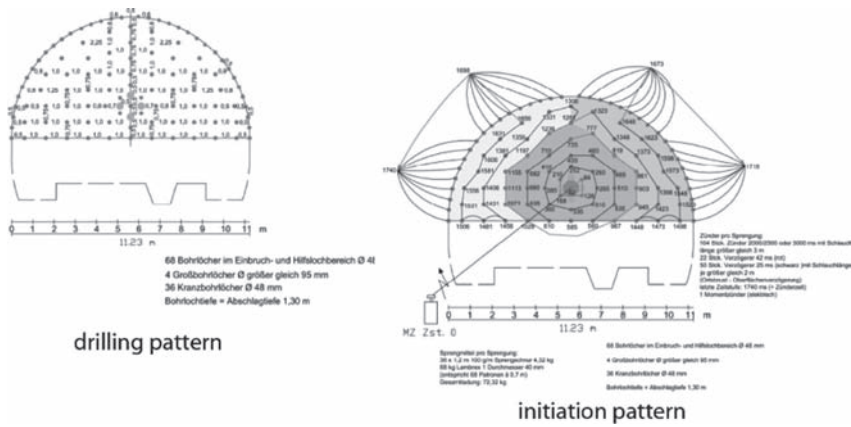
Drill and firing pattern for the roof of the cap of the Markovec tunnel.
